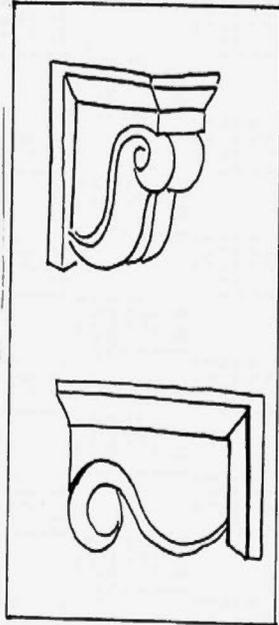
Drawing of wooden corbel supporting roof timbers (above Baroque ceiling) at Castello
